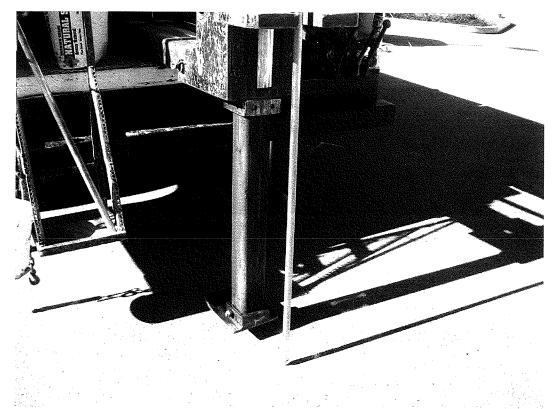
, Sampling rod / core barrel prior to subsurface placement.
